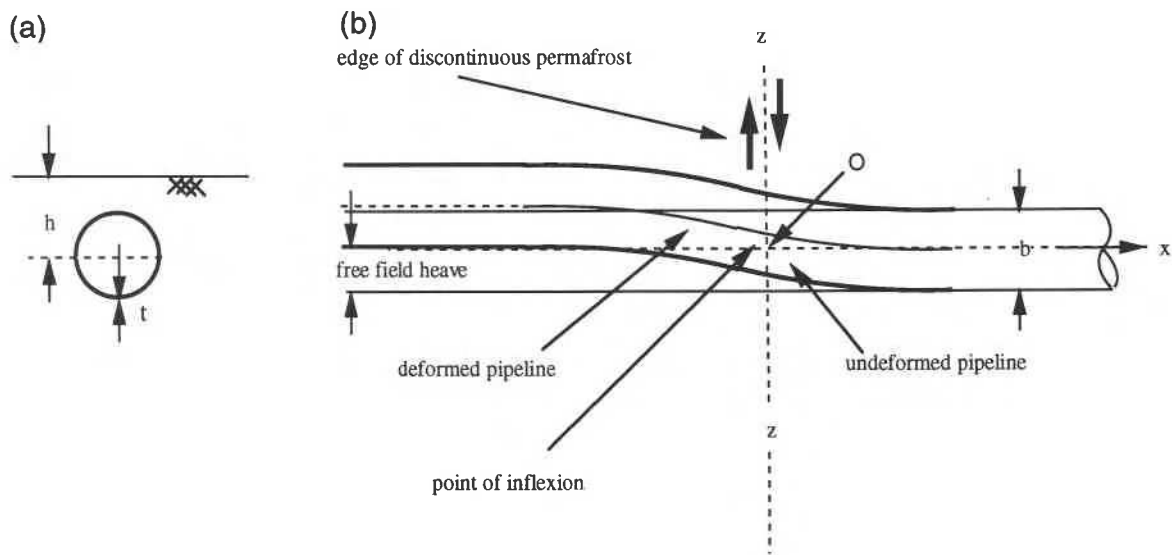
Beam embedded in a creeping medium. (a) Cross section. (b) Longitudinal section.
